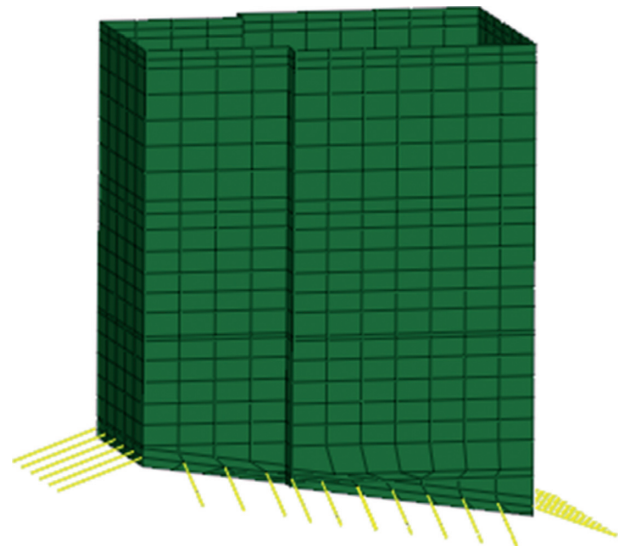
Schematic diagram of anchor lock foot suspended foot connecting wall model.
